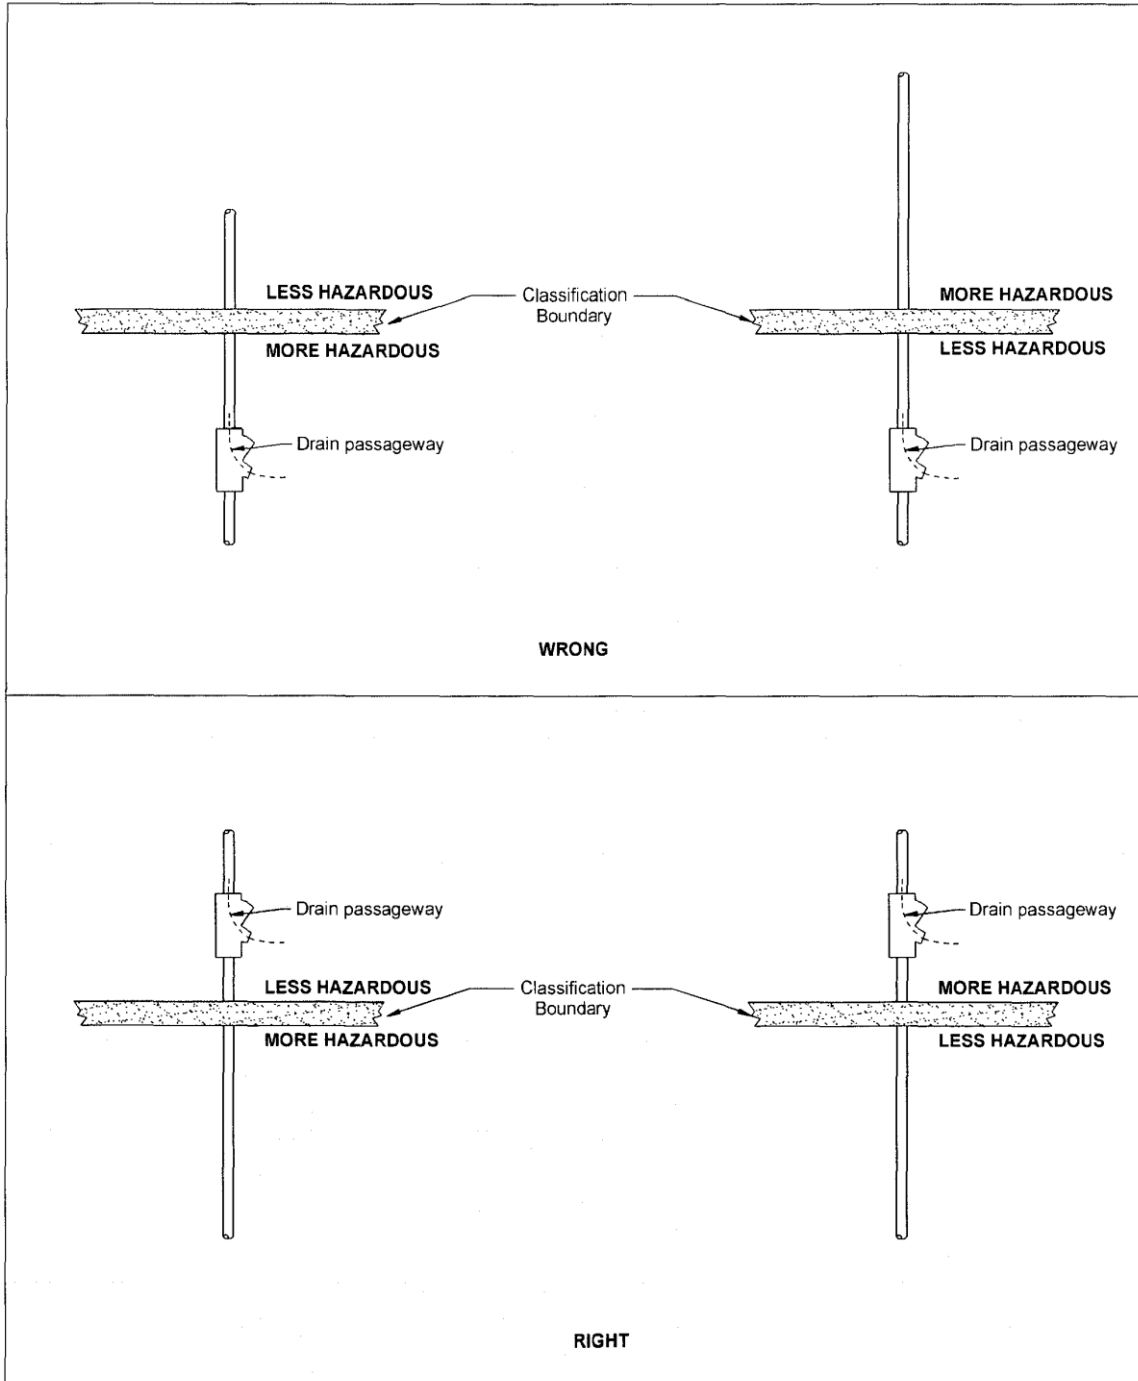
Typical Class 1, Division 1 or Division 2 Electrical Installation Placement of Drain Seals
